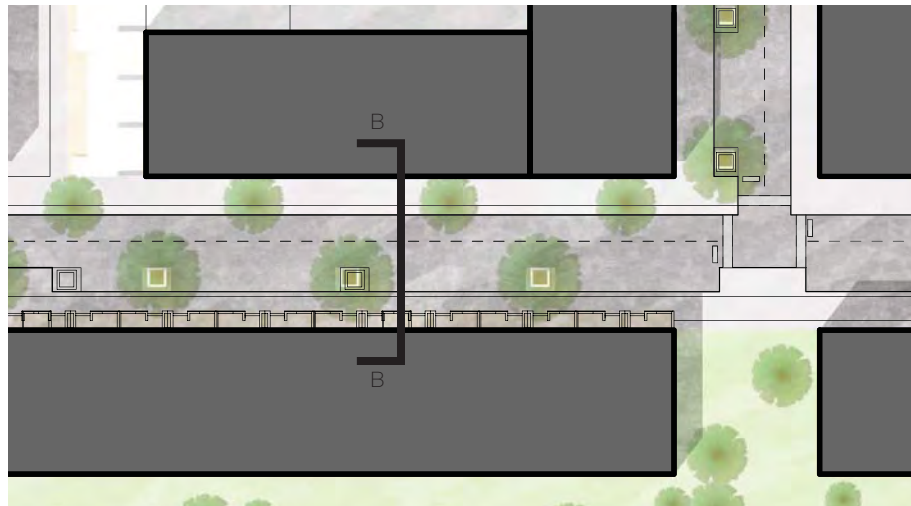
Plan of Two-Way Residential street - 20 m wide
